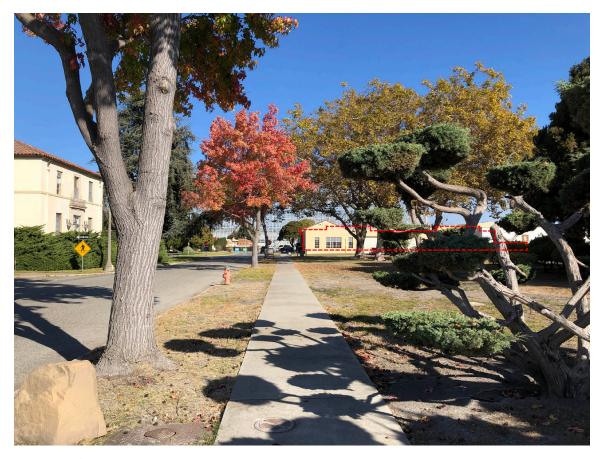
VIEW 2 - AFTER - SHOWING OUTLINE OF M2M LAB BUILDING AS IT IS OBSCURED FROM SIGHT BY EXISTING BUILDINGS
